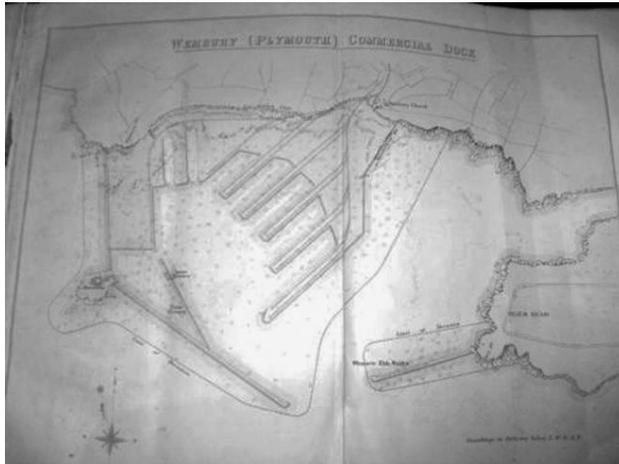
1909 plan illustrating one (“finger quay”) layout concept for the proposed Wembury Dock (HL Deb., 1909).
